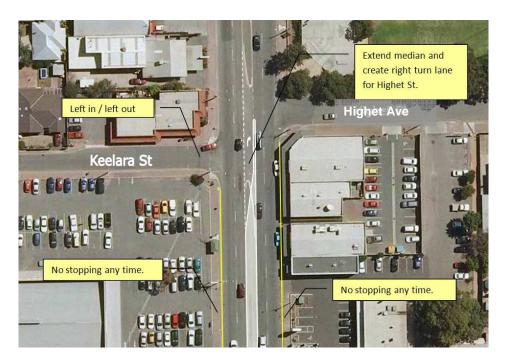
Proposed Brighton Road / Keelara Street / Highet Avenue improvements
